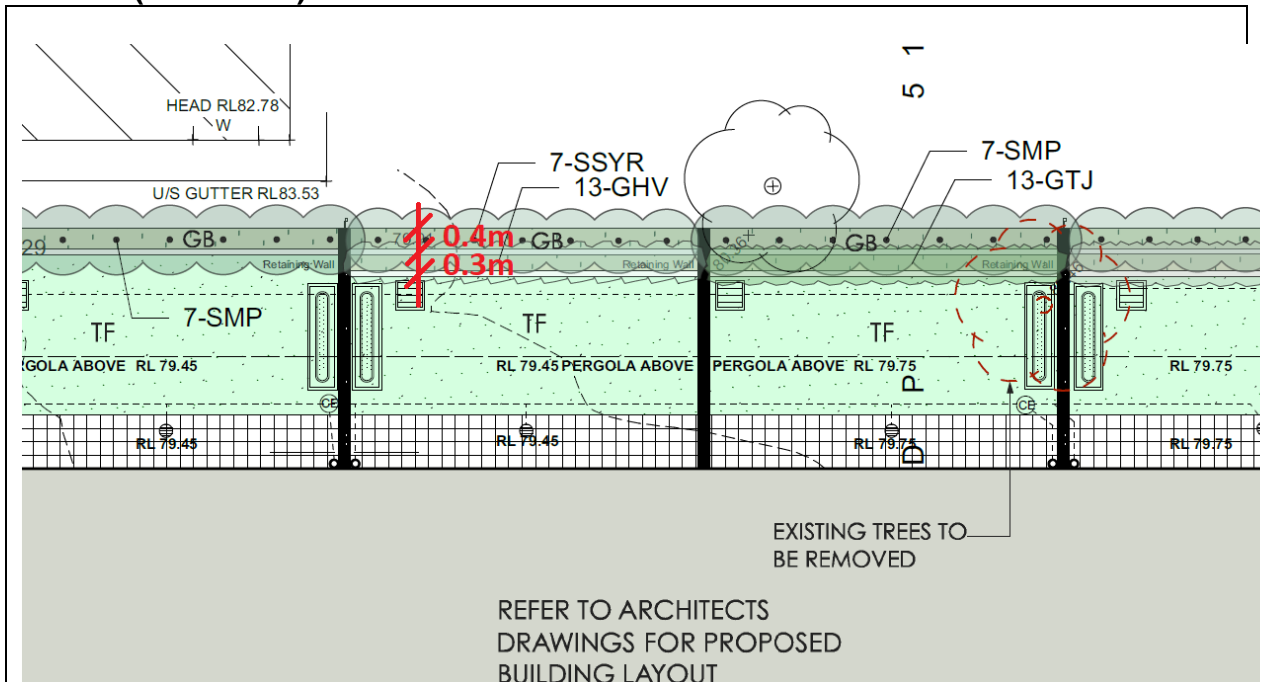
Landscape Plan extract indicating insufficient planting bed width within private open spaces to allow suitable screen planting to be provided
